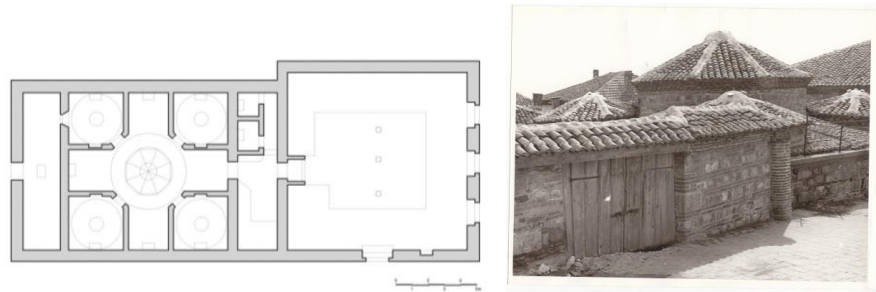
Floor plan (left) and photo (right) of Hammam in Vranje. Drawing A.M.Petronijević according to [1], photo [9]
